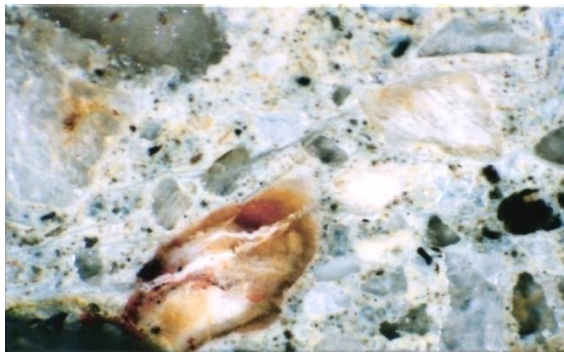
Micro-cracking in the concrete due to ASR (Menendez, 2016)
